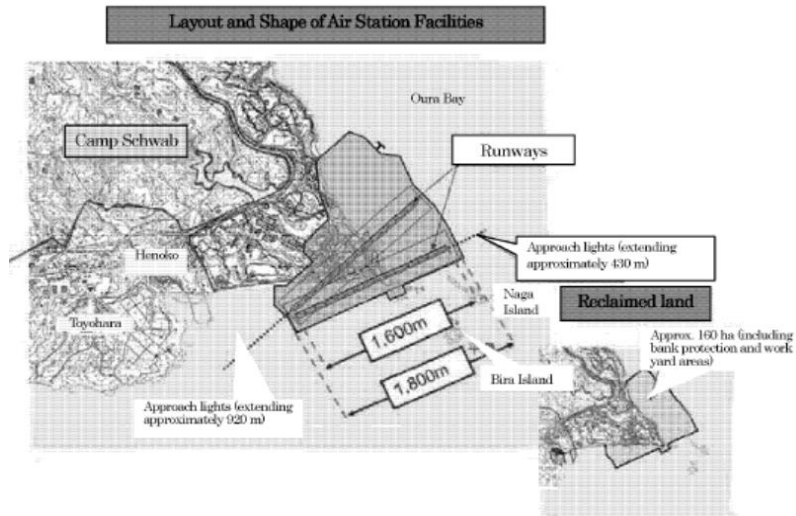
Layout and Shape of Air Station Facilities
